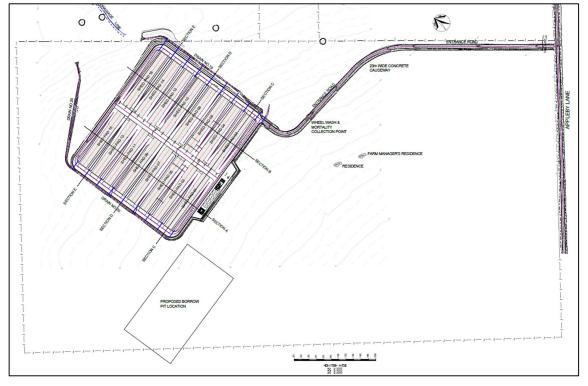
Stormwater Management Plan (Hanlons Consulting, 2024)
